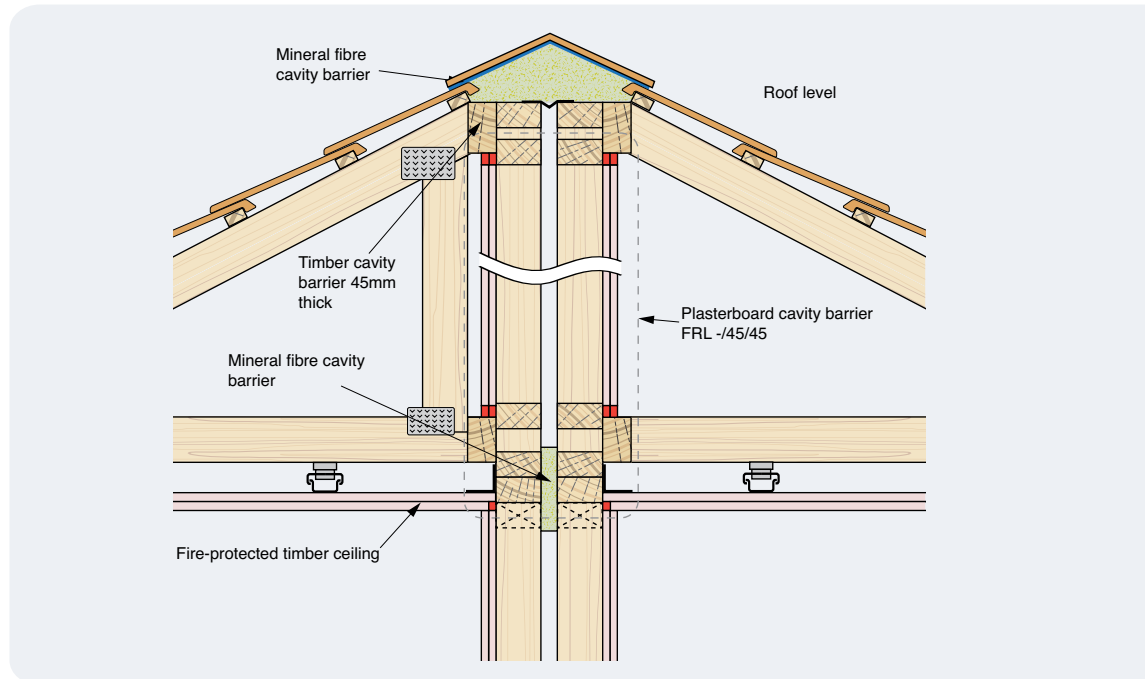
Roof space Option 2 fire-protected timber ceiling and cavity barriers within roof space.
